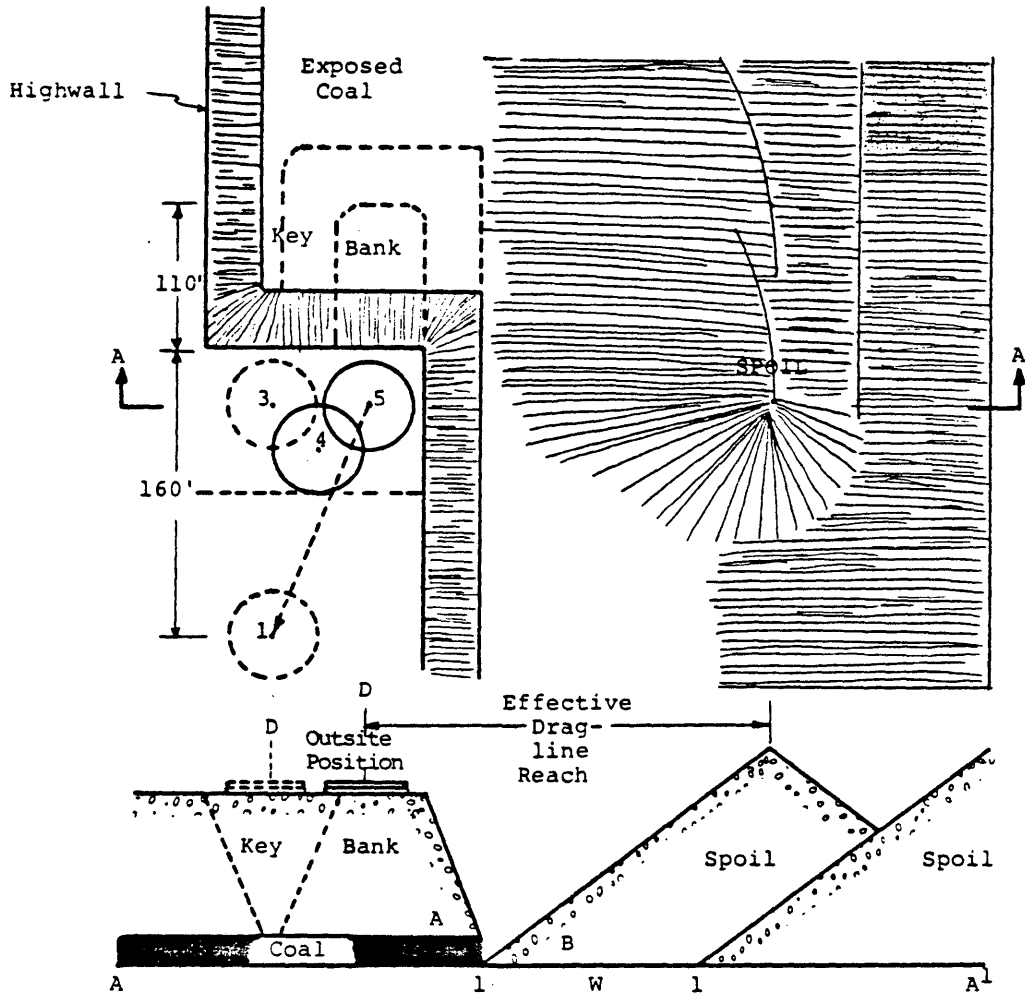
Plan and Cross Sectional View of Dragline Positions to Remove Bank Material.
